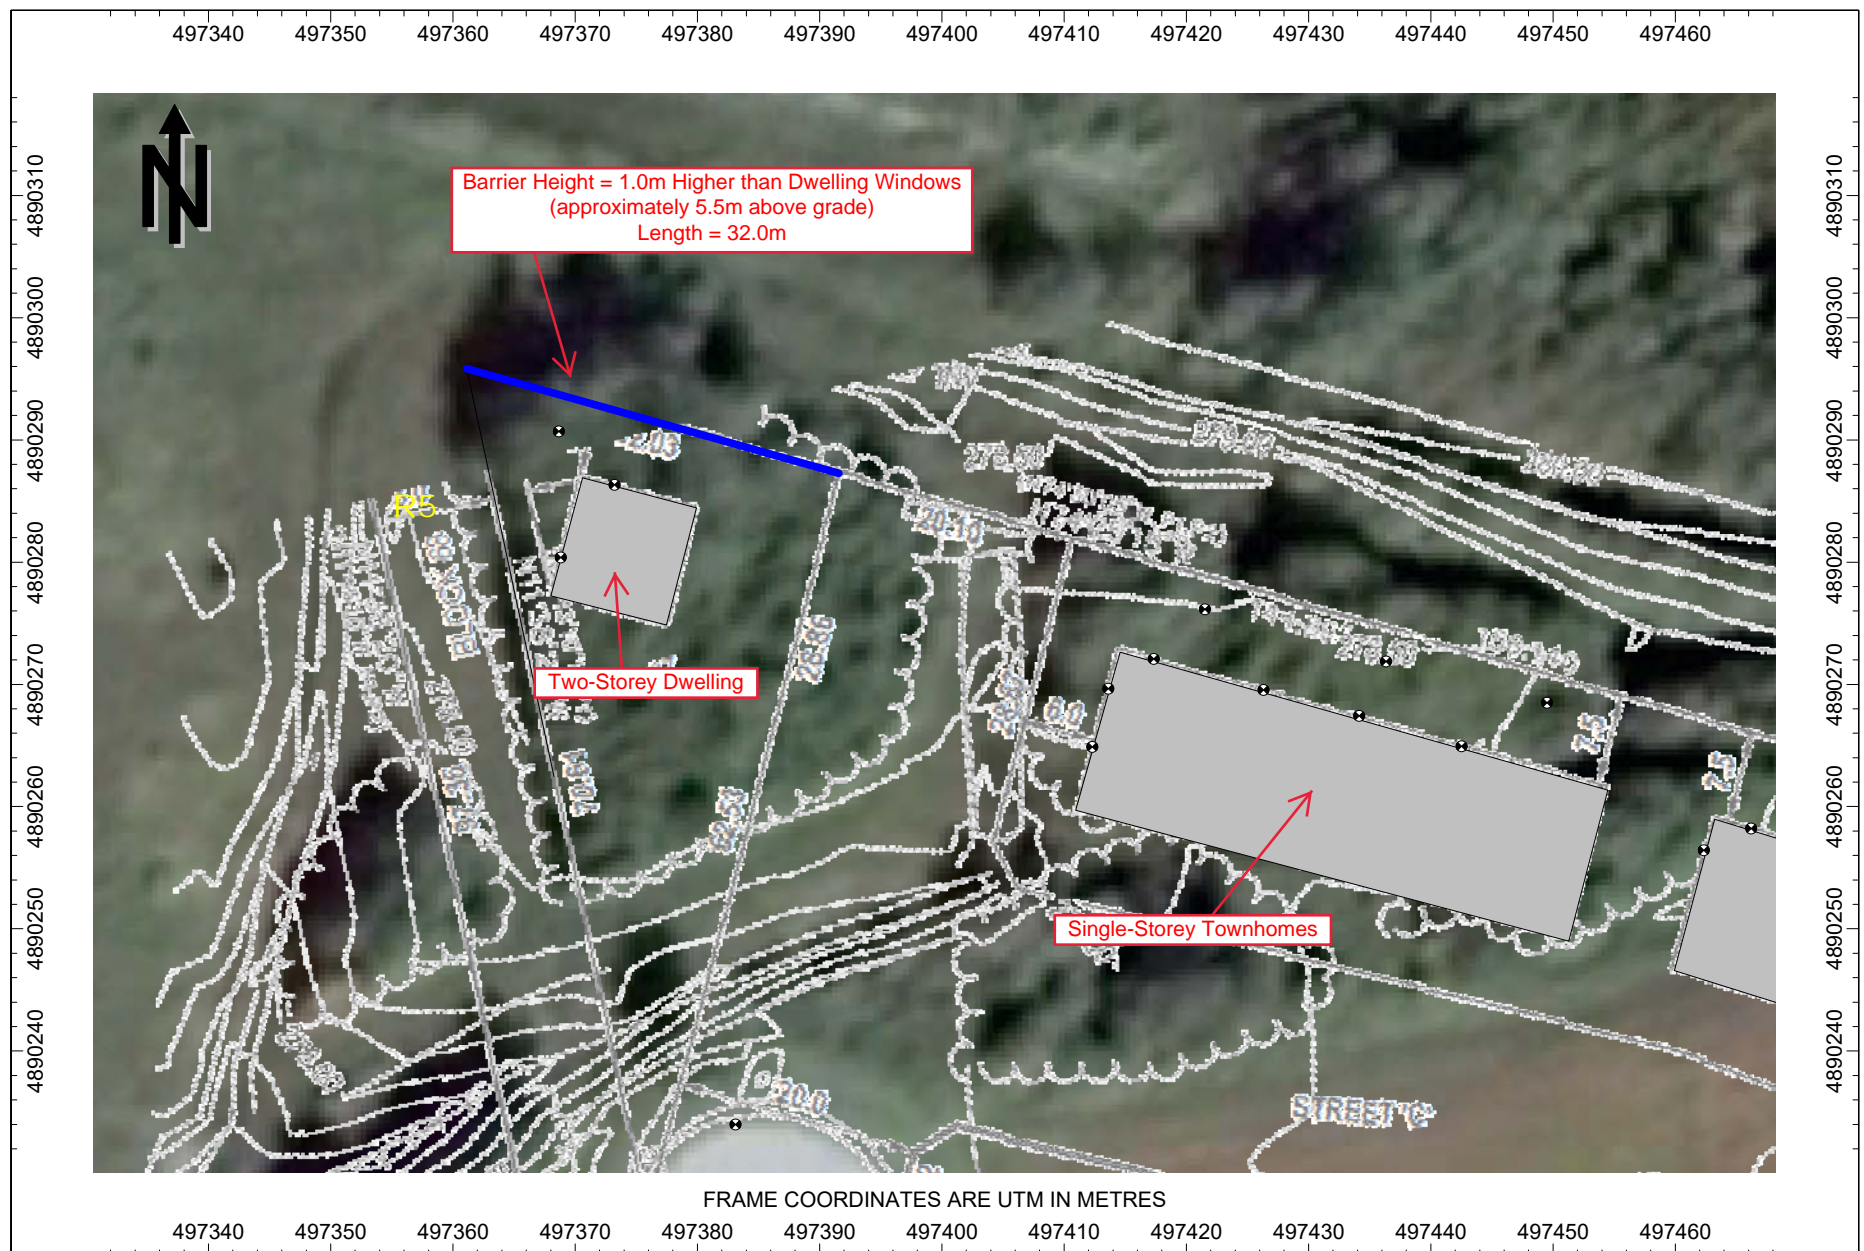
A: Noise Barrier Dimensions - Barrier North of Lot 67 With Single-Storey Dwellings in the Townhouse Block East of Lot 67
